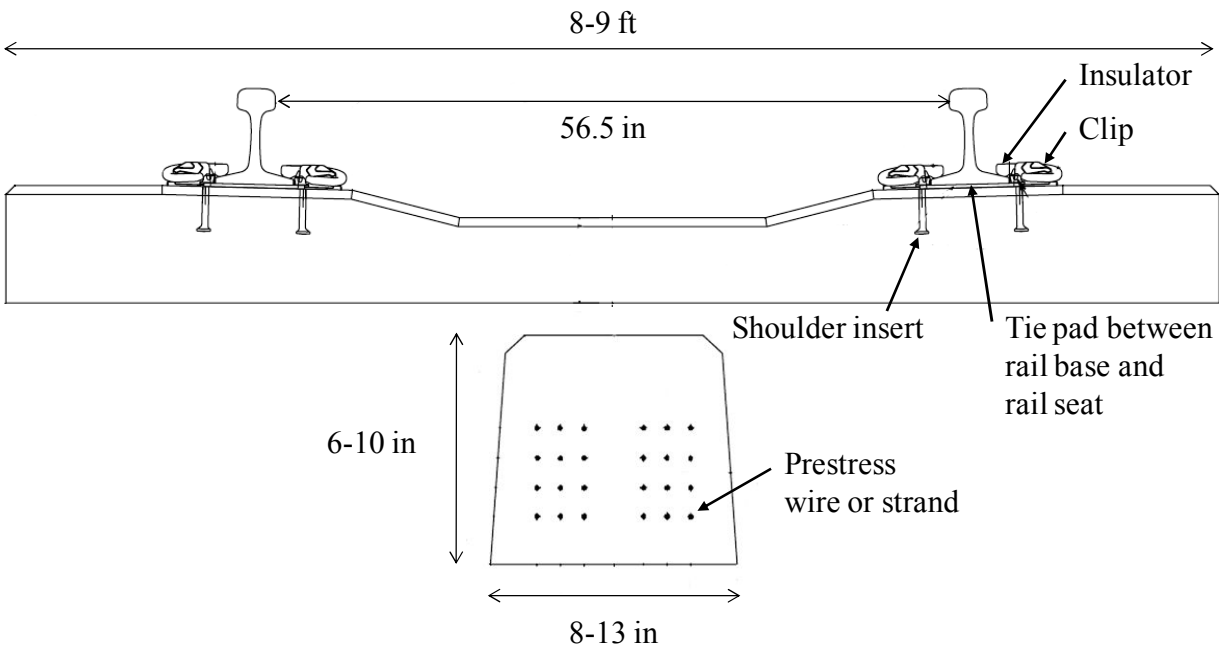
Typical prestressed concrete tie today (adapted from Amtrak 2006)
